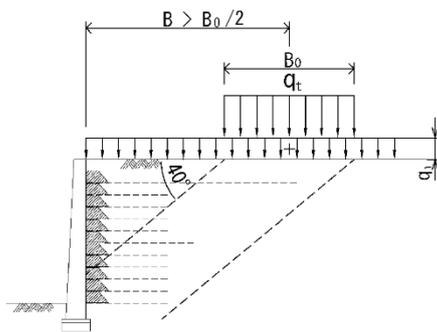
Size and distribution of surcharge (Railroad track is far from the wall face)
